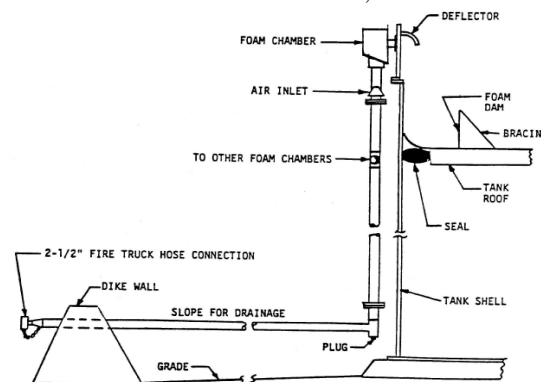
Illustrates Fire Protection system for a Floating Roof Storage Tank [NFPA 11, 2005]
